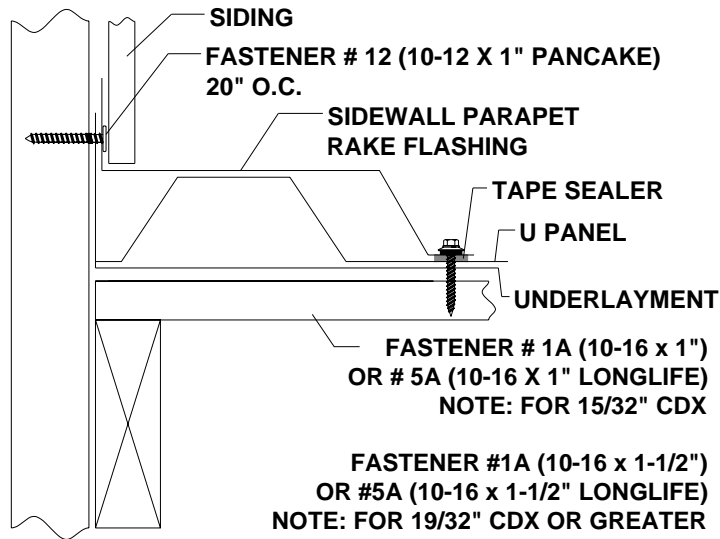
Typical Sidewall Parapet Rake Flashing Detail
